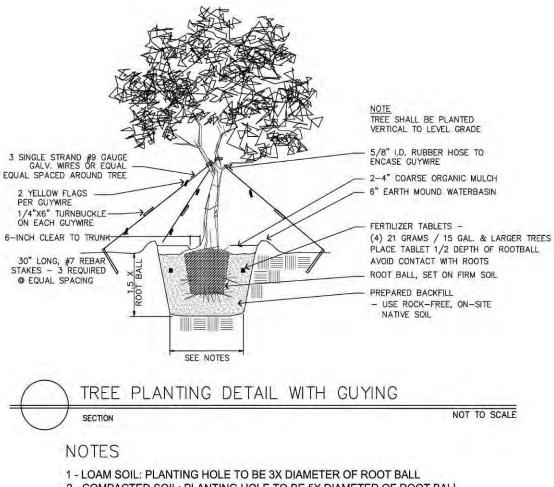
TREE PLANTING DETAIL WITH GUYING
